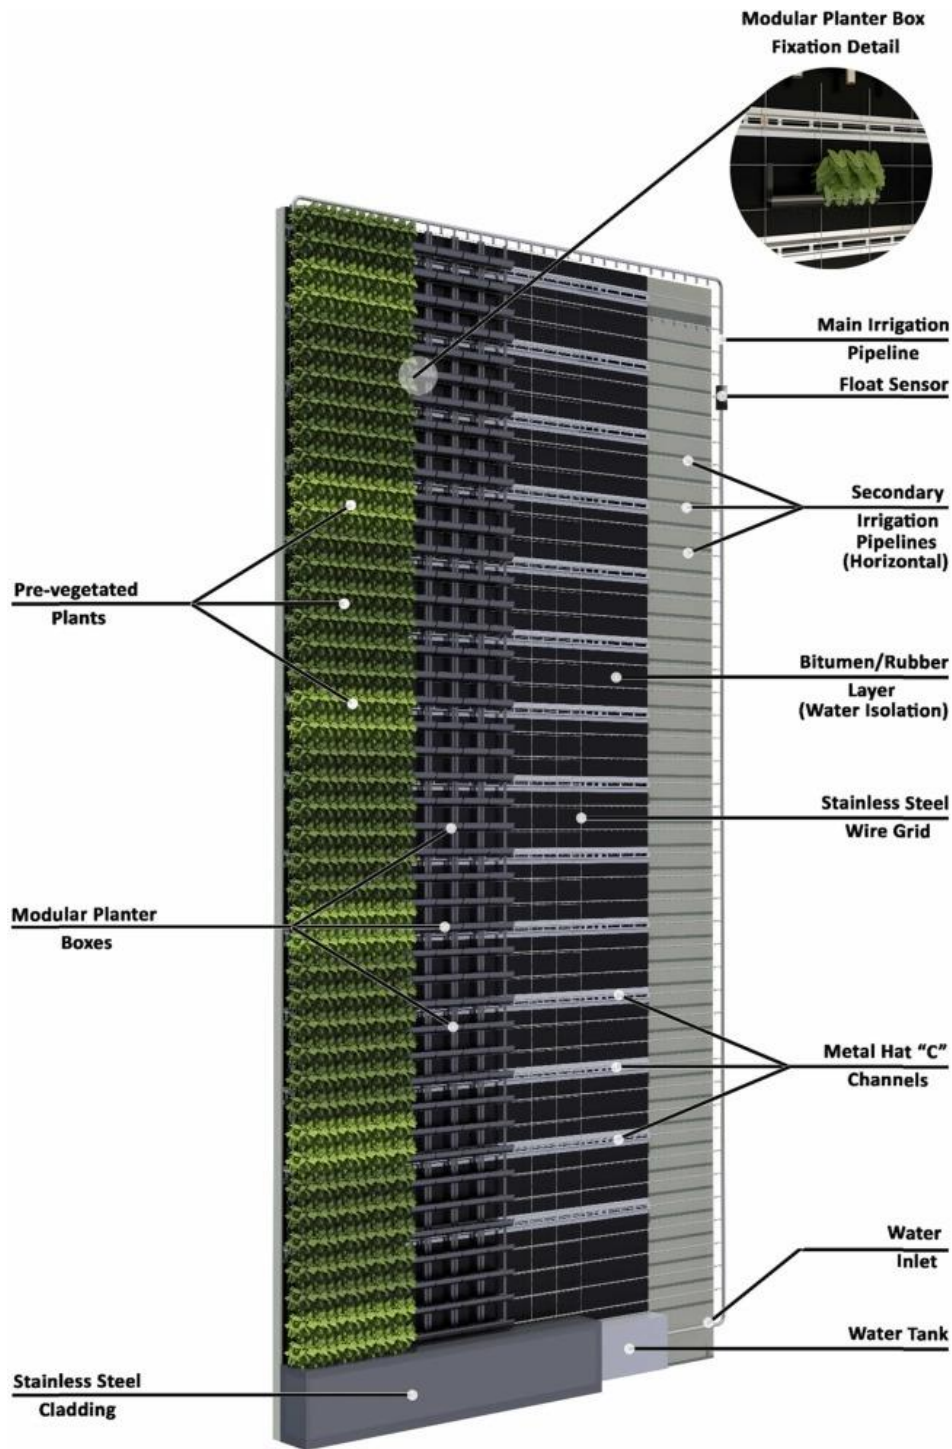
Detail of outdoor planter box-based system showing its main components and fixation to the wall.
